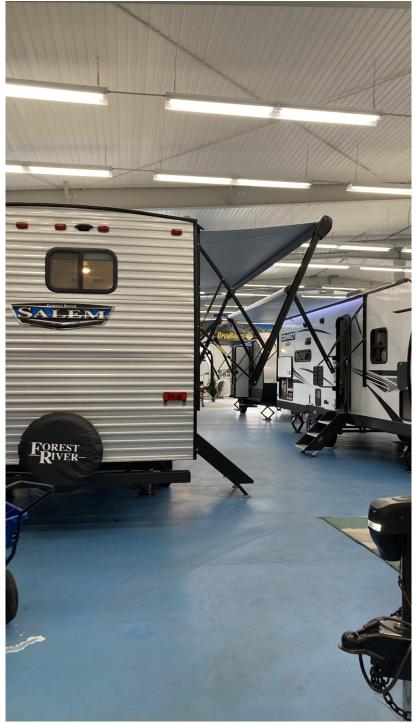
The concrete floor was in a good condition with minimal cracking.
